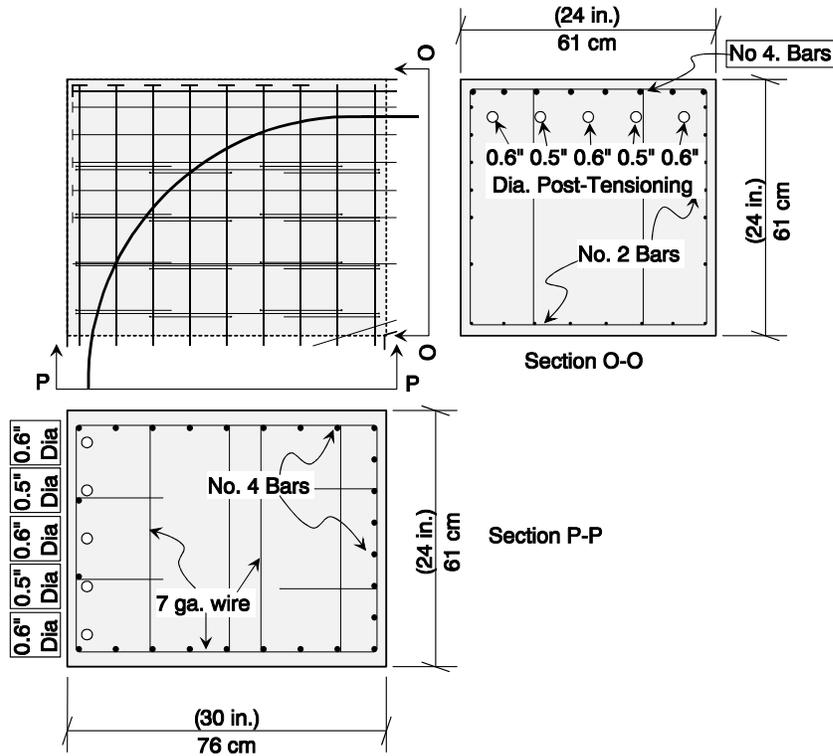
POJ-PU-74-TH joint reinforcement details
